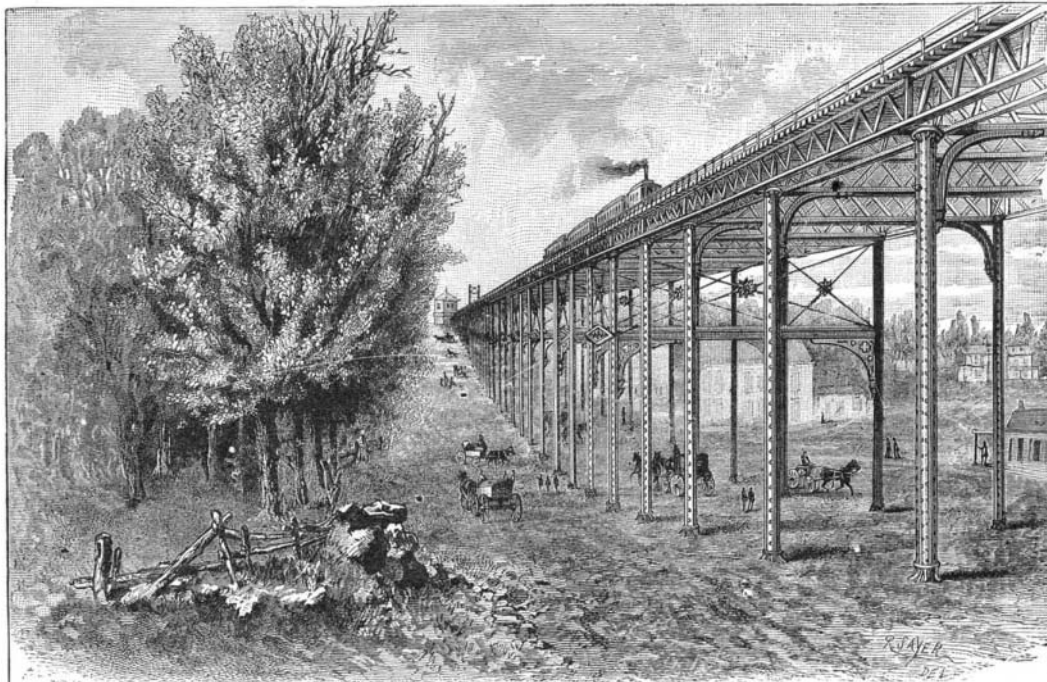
PORTION OF THE ROAD BEYOND CENTRAL PARK ON POSTS FIFTY-SEVEN FEET HIGH.
